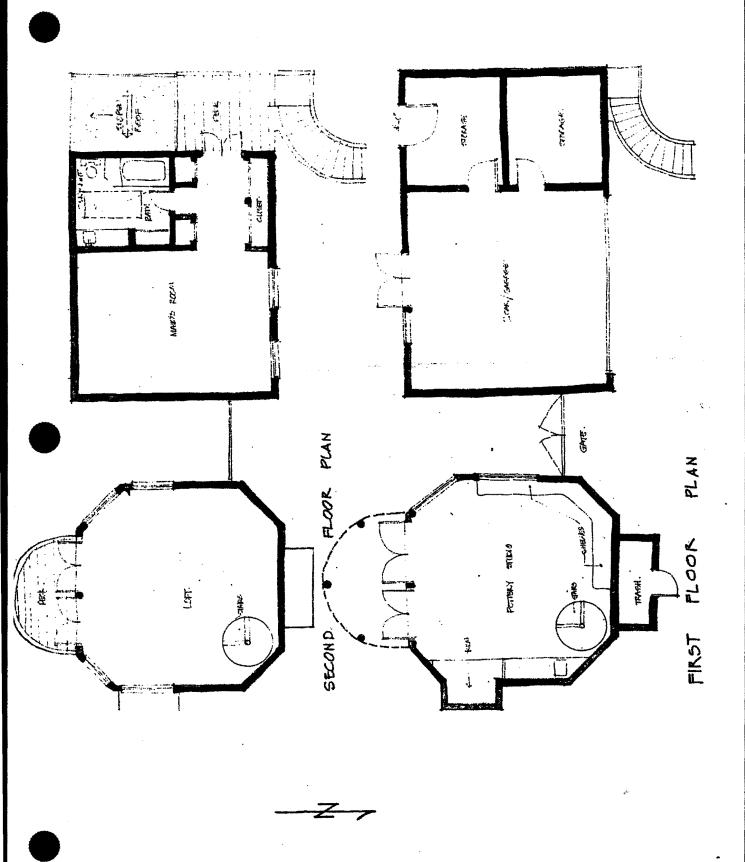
(4-97-111) Floor Plans for Existing Structures as Previously Approved by CDP 79-5287
